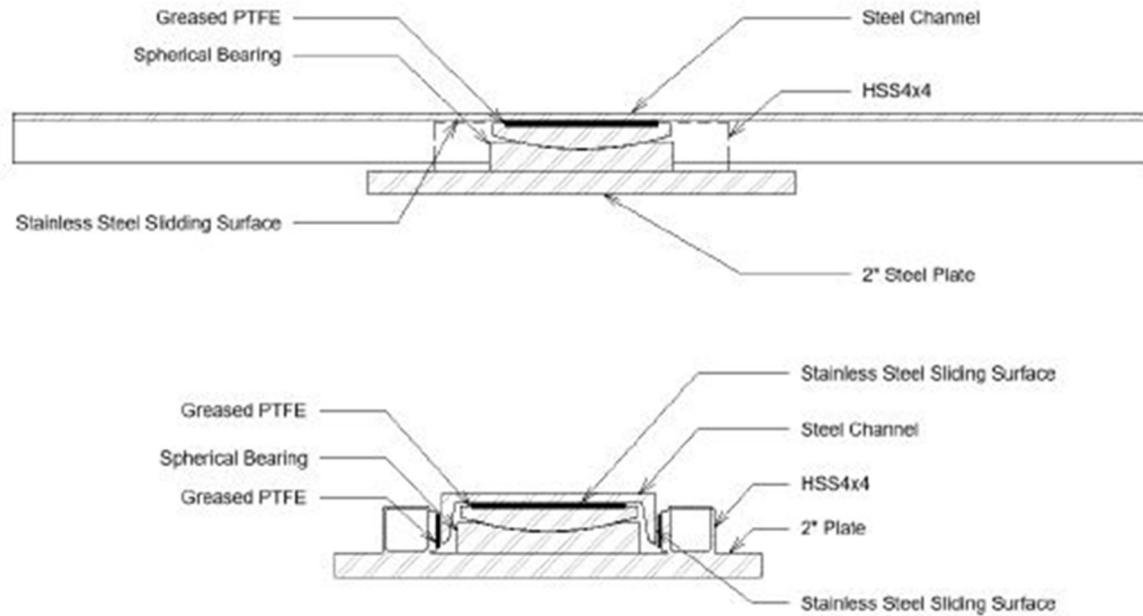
Axial Bearing Assembly for Specimen 30-21
